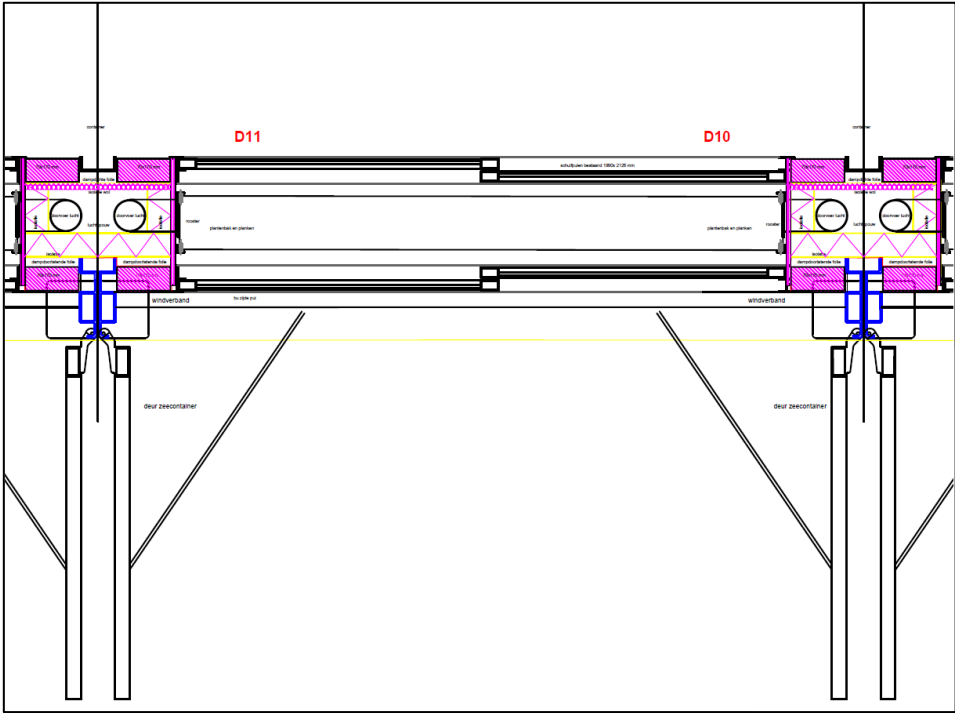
Horizontal section of one of the facade modules Source: (Door Architecten, 2018)
